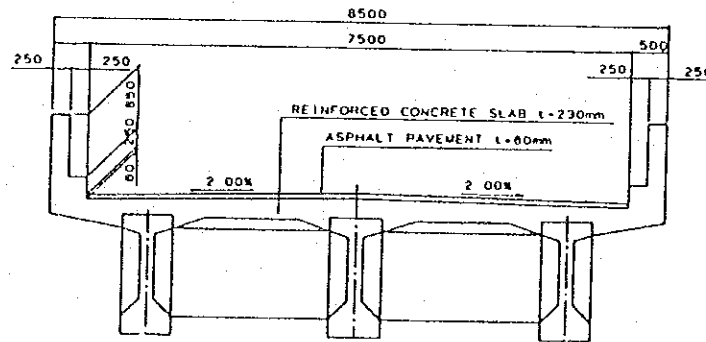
Standard Cross-section of Bridges for Section I
